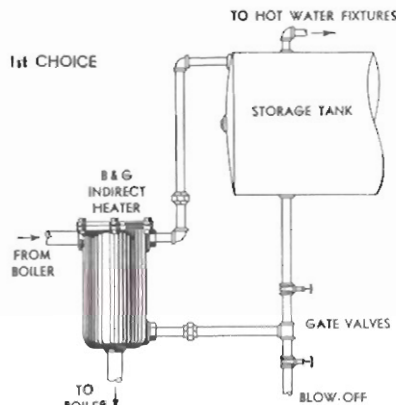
The hot water connection from heater to tank is separated from the outlet to the fixtures, preventing any mixing of cooler water.
